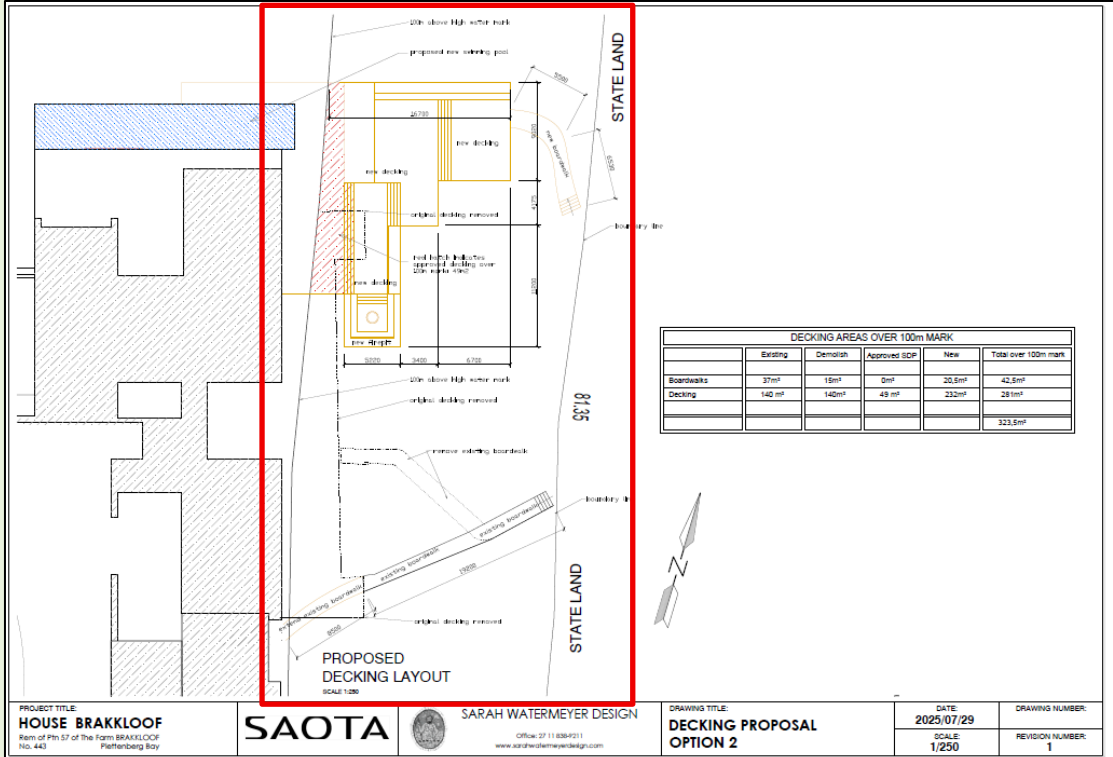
Proposed Site Development Plan (*Deck and Boardwalk Only – outlined red area) see Appendix B1 for clearer image
